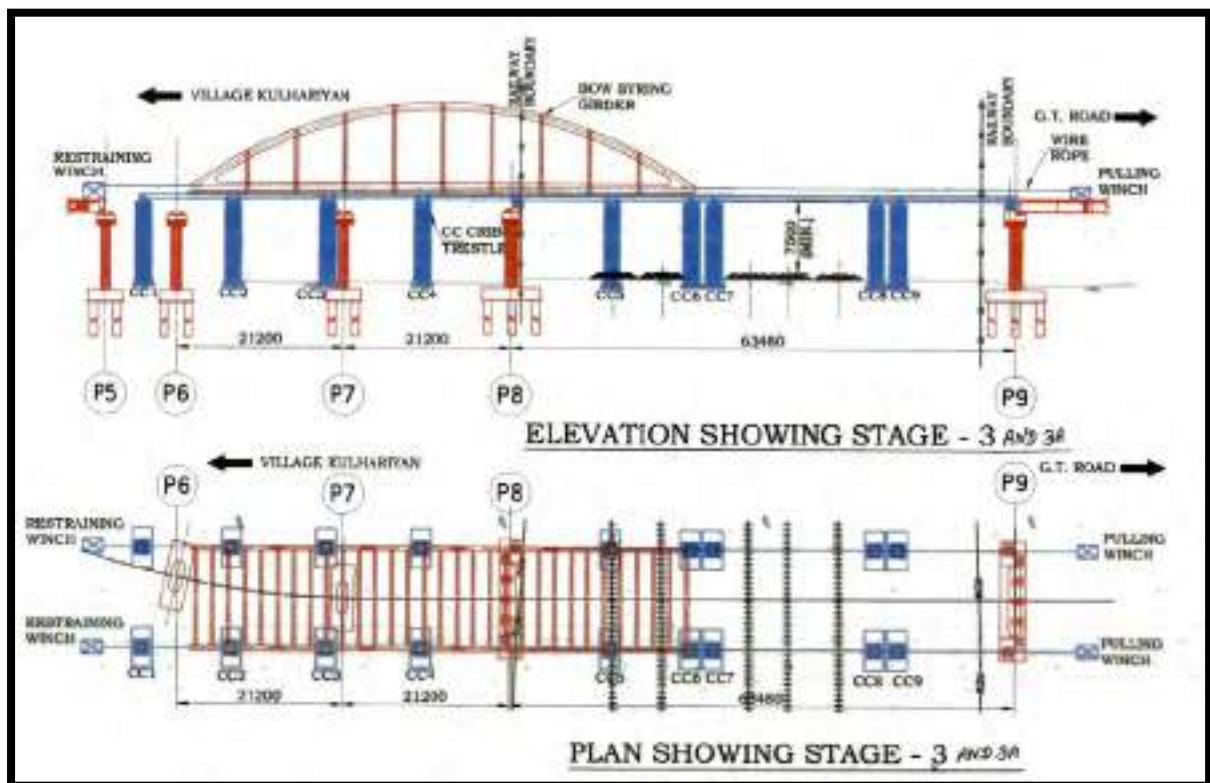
Elevation and Plan of Launching Stage-3, 3A
